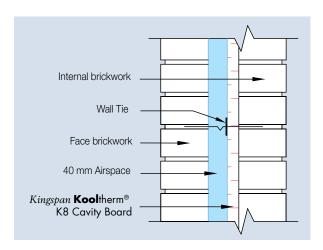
Side elevation – Double brick cavity wall with Kingspan Kooltherm® K8 Cavity Board
